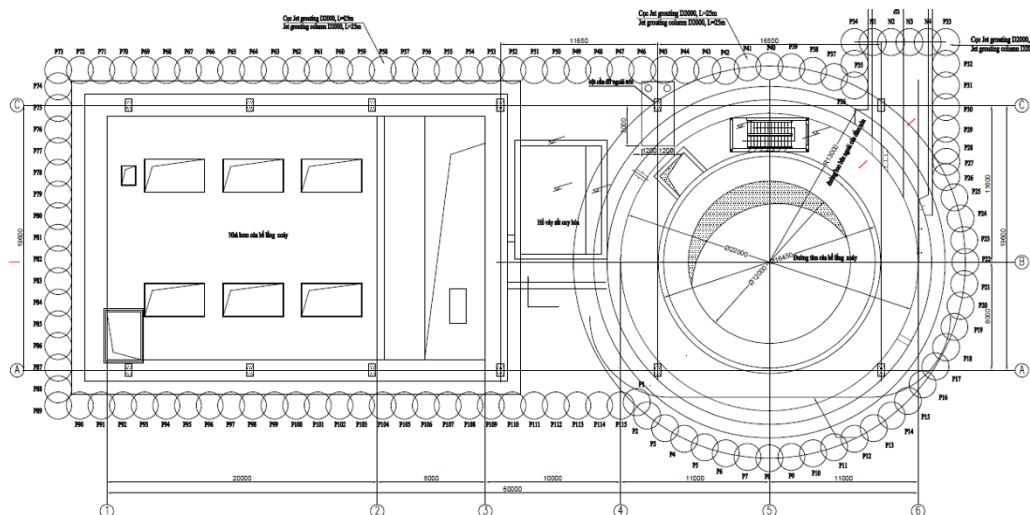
Jet grouting for a waste tank in Hoa Phat Dung Quat Iron and Steel Complex Project
